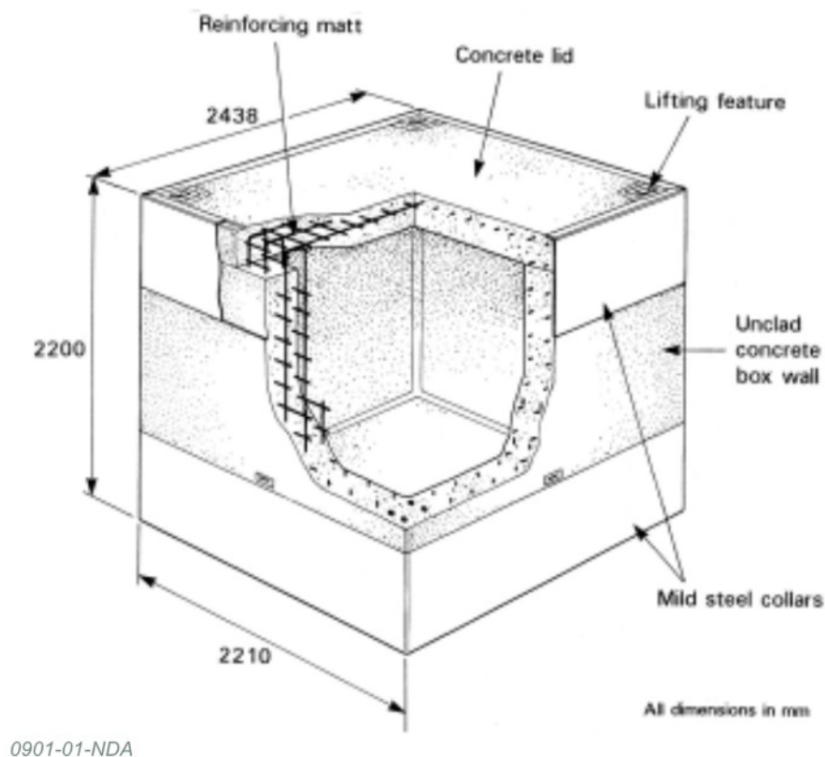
Cross-section of a concrete box container with its features labelled [10]
